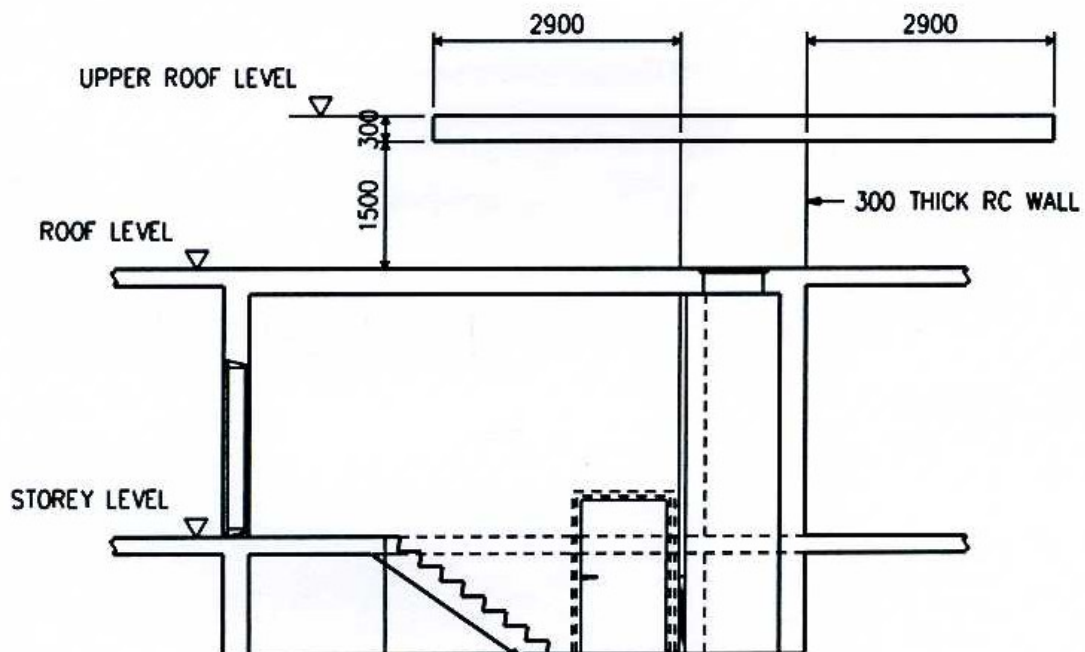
(a-4) PLAN OF STAIRCASE STOREY SHELTER AT UPPER ROOF LEVEL
